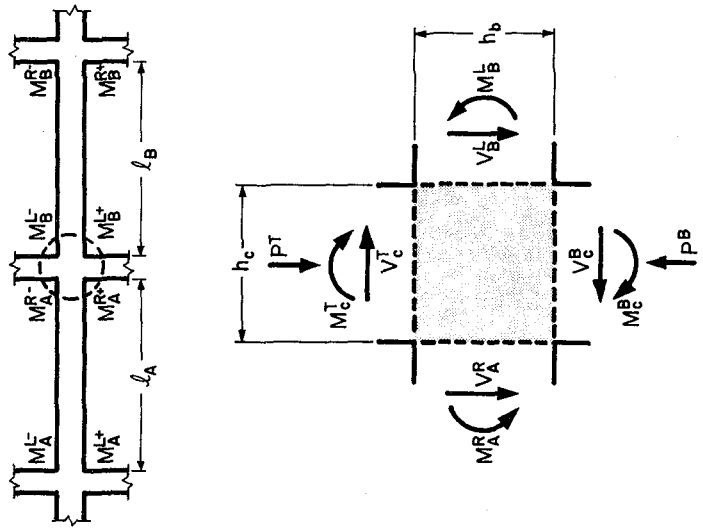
FORCES AT A TYPICAL BEAM-COLUMN JOINT
